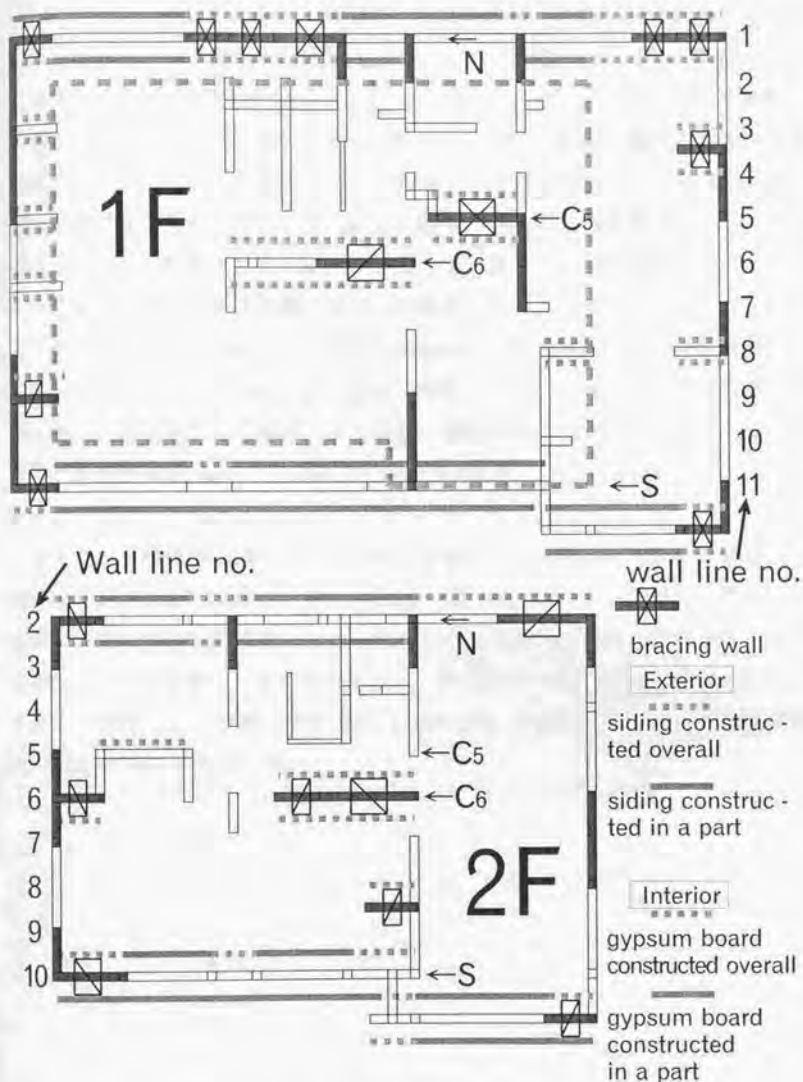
2. 3. Schematic plans of the tested house with a symmetric shear walls layouts of spec. nos.. 2-6.
